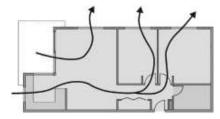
effective layout for an upper level corner dwelling/apartment.
